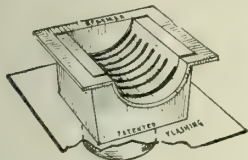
GUTTER DRAIN FOR CONCRETE OR WOODEN FLOORS
